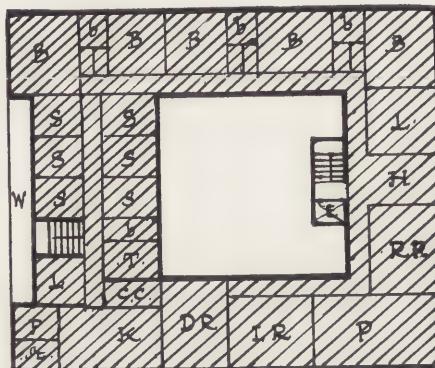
Key Floor Plan—One Large Apartment to the Floor, Built Around a Central Courtyard.
